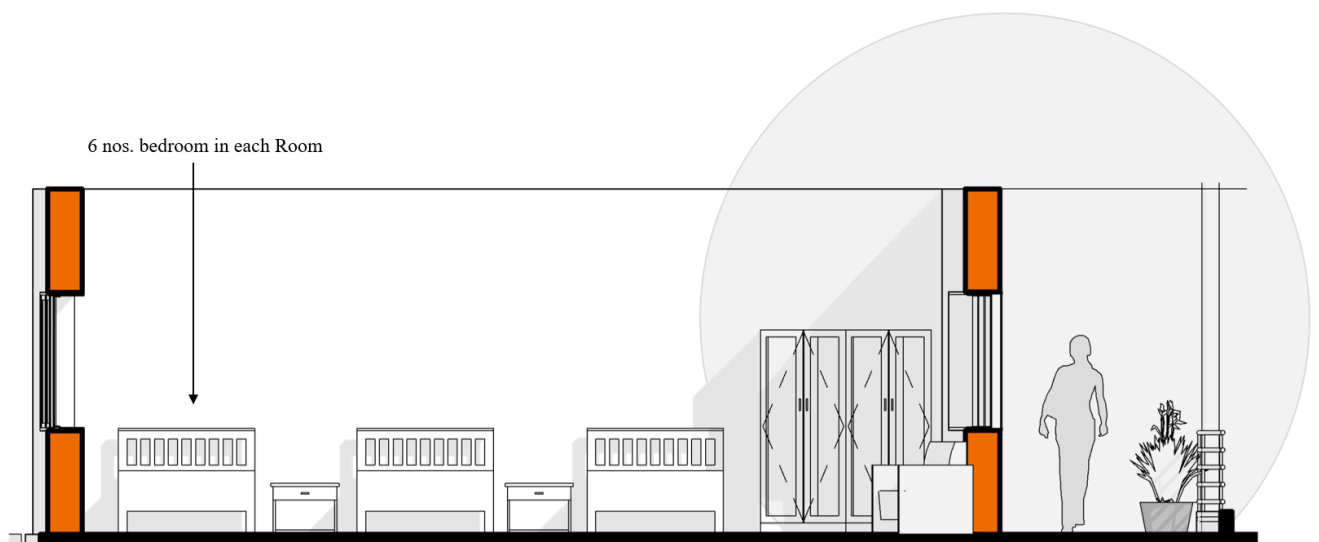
Sectional View of Accommodation Unit for Single Women in First Floor
